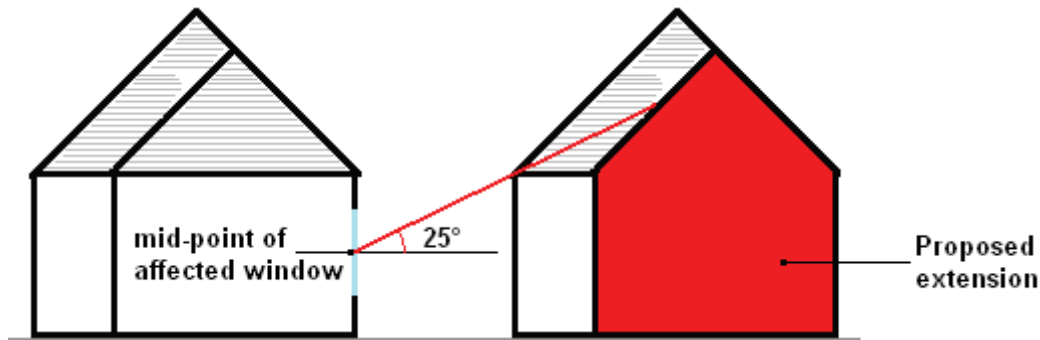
Fig A: Proposed extension may result in loss of daylight to adjacent window of a habitable room
